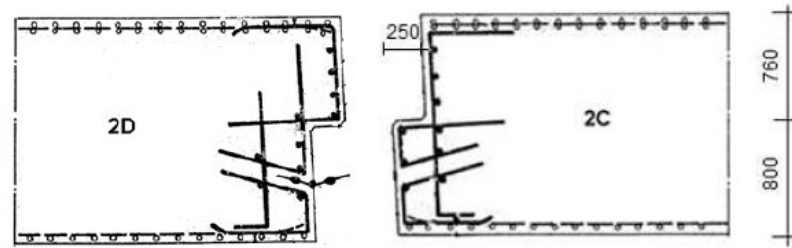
Reinforcement in the shear key in the Floor of the Kiltunnel (dimensions in mm [3])
